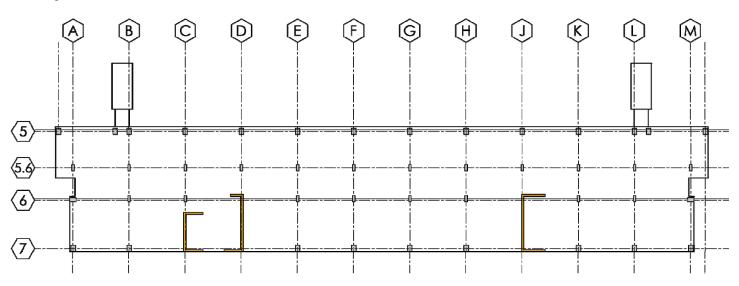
Shear walls on typical floor (Floors 6 through the top mechanical level)
